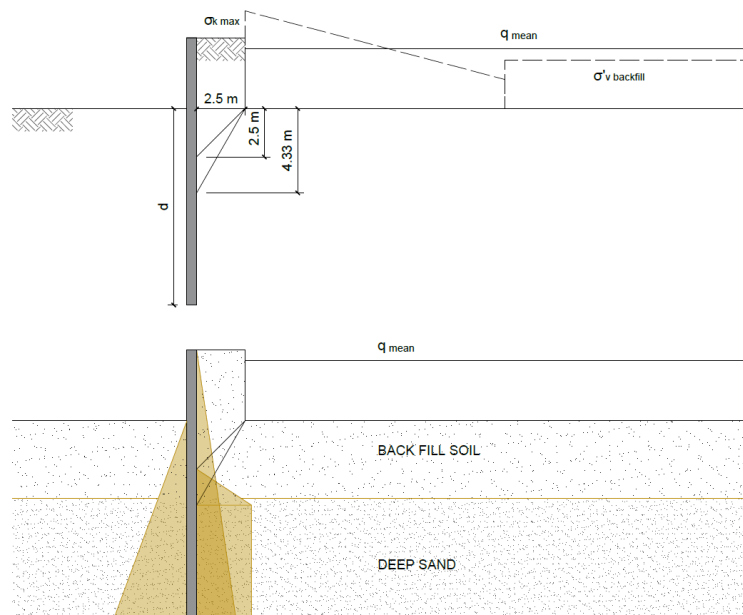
Loads schematization (above) and the horizontal stresses (under) acting and on the sheet pile
